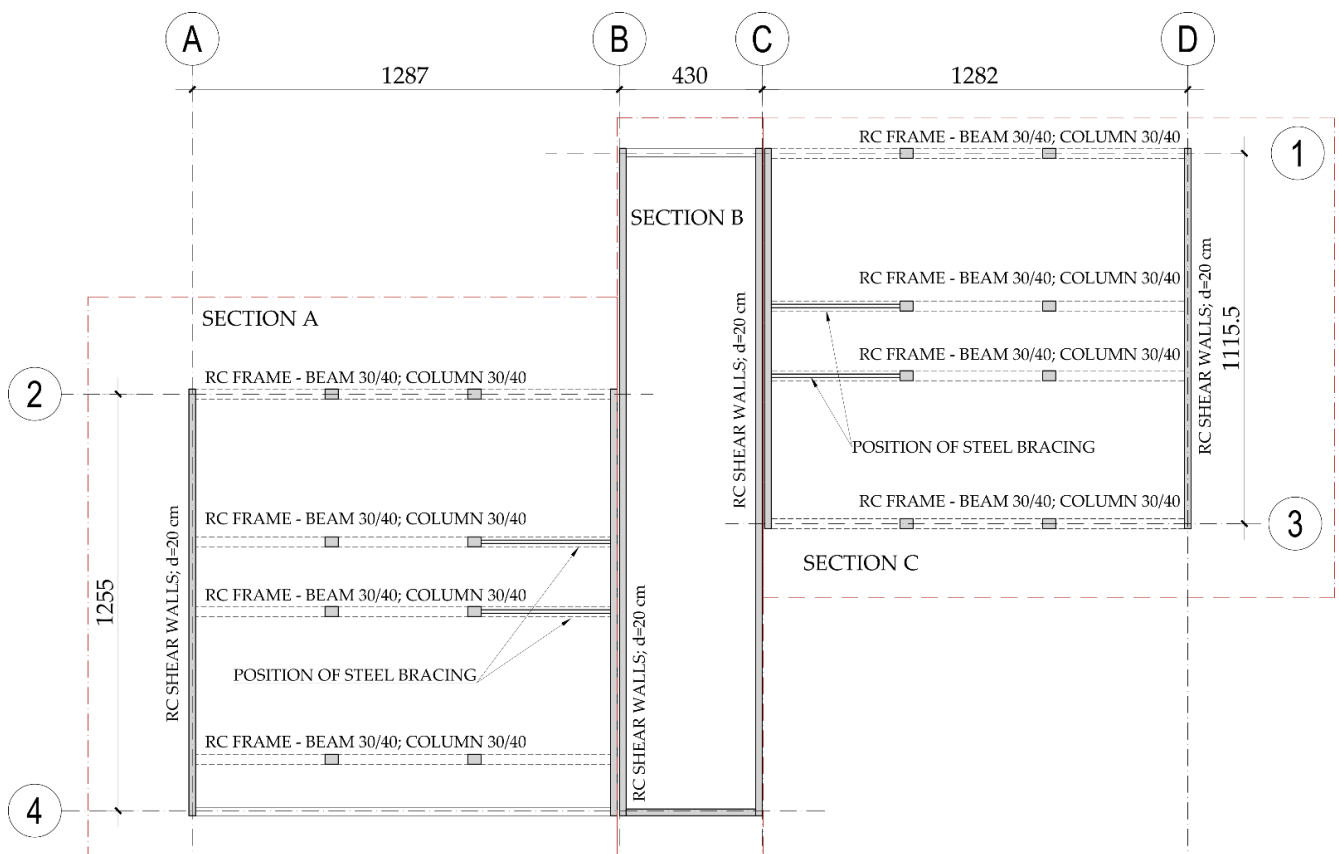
Characteristic floorplan of the case study building (all units in cm).
